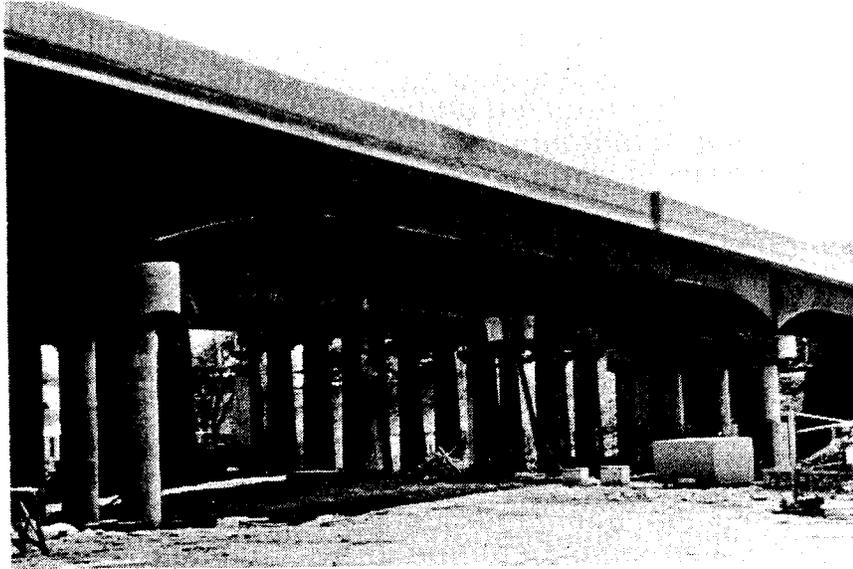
View of the center span of the three-span, continuous steel girder 5th Street bridge.
